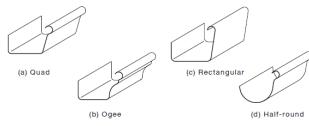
(A) TYPICAL EXTERNAL EAVES GUTTERS
